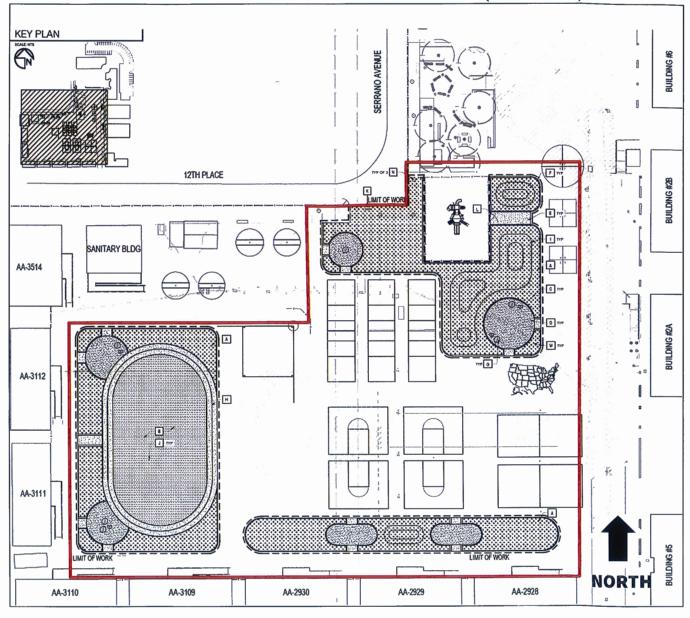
## EXHIBIT A - LORENA STREET ES SITE PLAN (not to scale)
